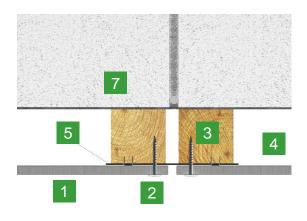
Horizontal section. Jamb with Hardie[®] Panel board.
